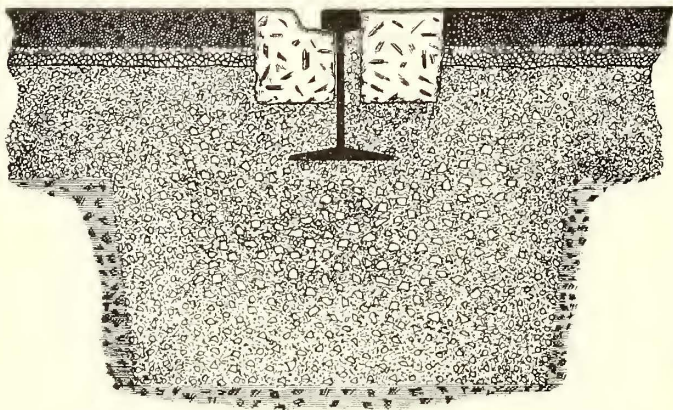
T-RAIL CONSTRUCTION USED IN MINNEAPOLIS
